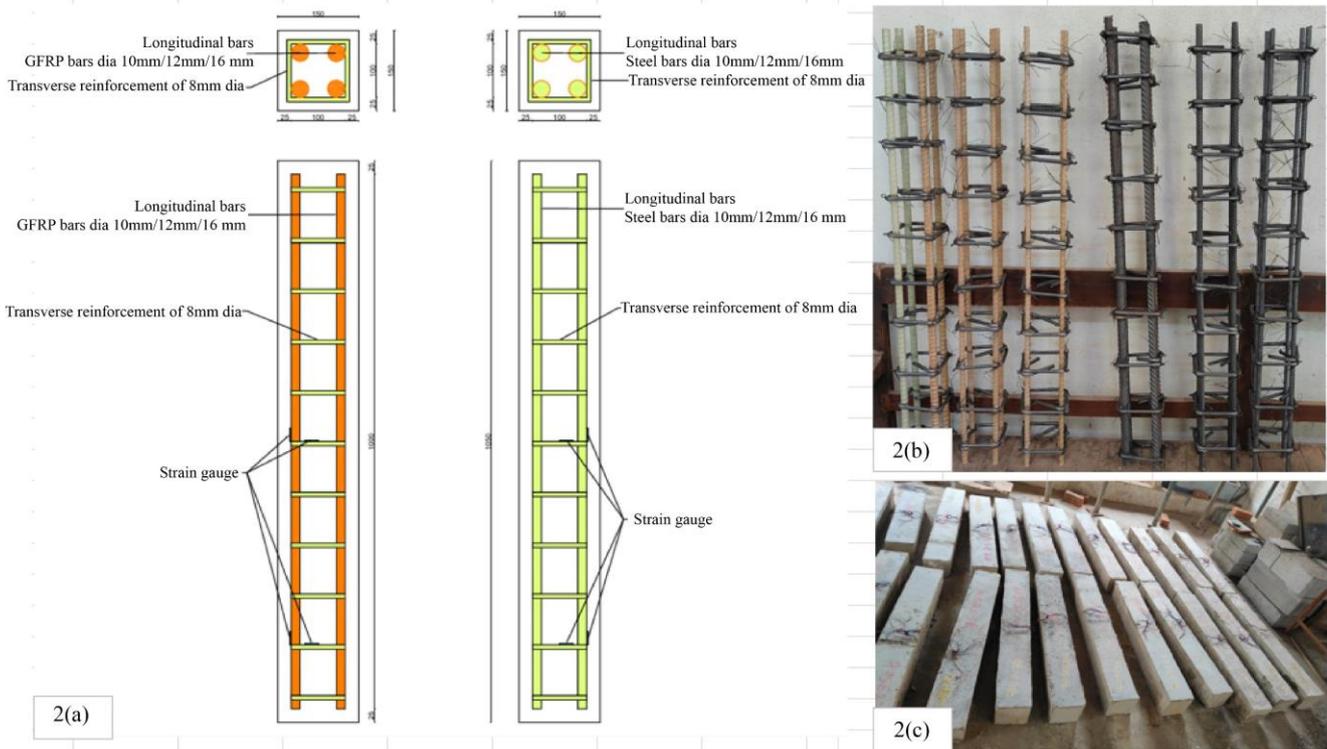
(a) Schematic drawing of the fabricated reinforcement members, (b) Actual fabrication of reinforcement, and (c) Specimens after curing, arranged for testing.
